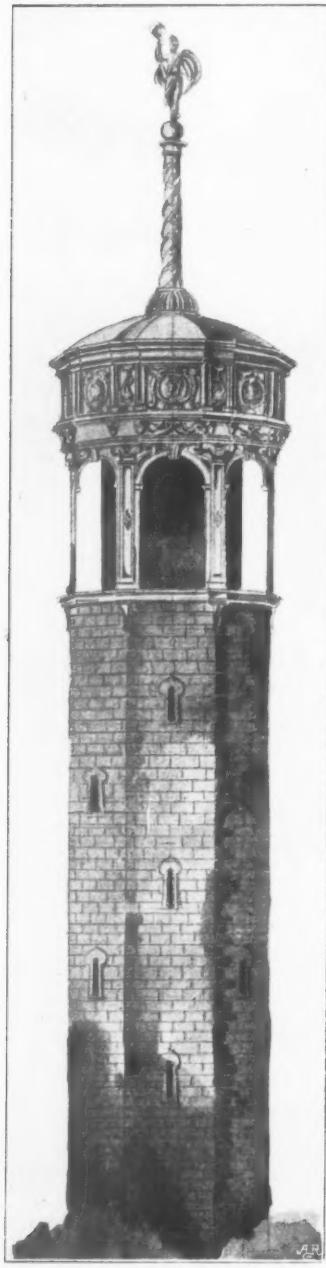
LEAD TANK WITH GIROUETTE FOR A WATER-TOWER.
